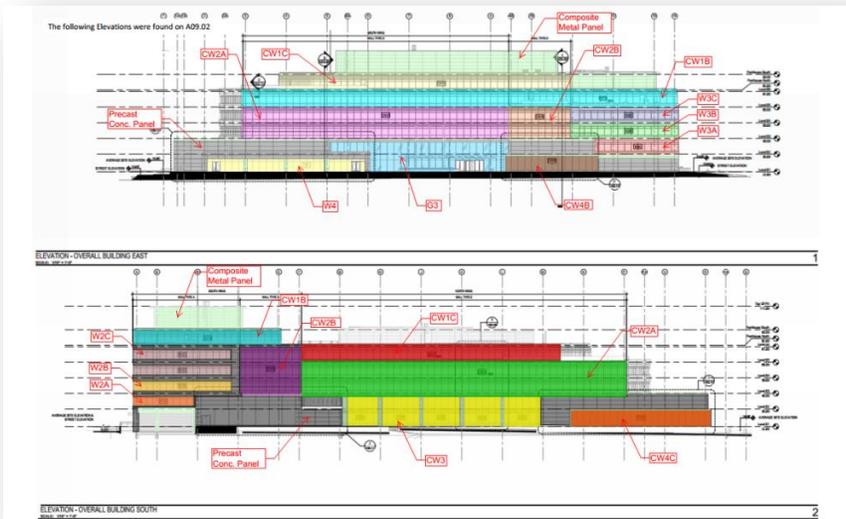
Façade Material Breakdown of East (Top) and South (Bottom) Elevations from Sheet A12.03
